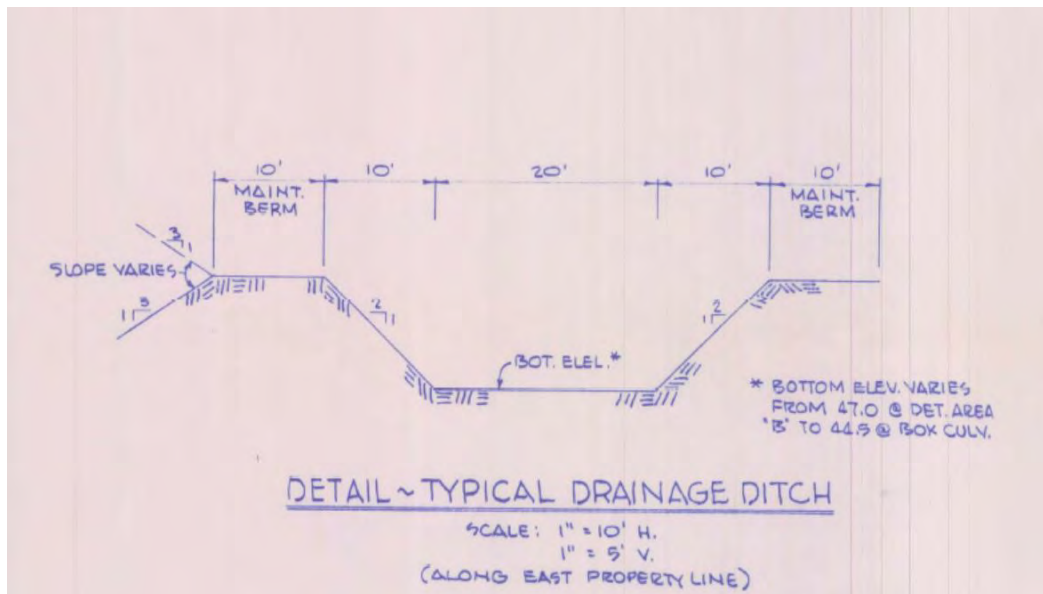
ERP 8744 Walsingham Reservoir, Outfall Channel Typical Section
